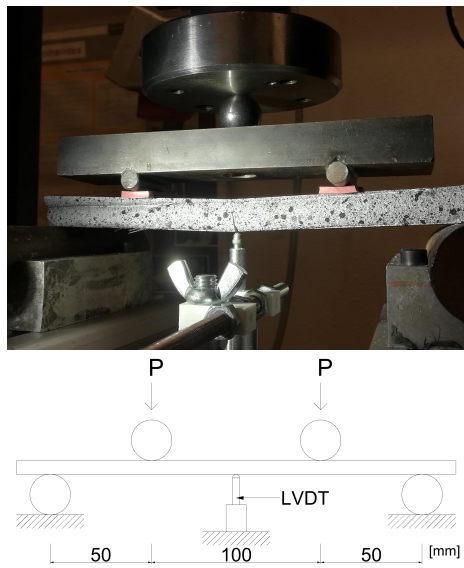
View and schema of the test setup for 4-point bending of multi-layer specimens.
